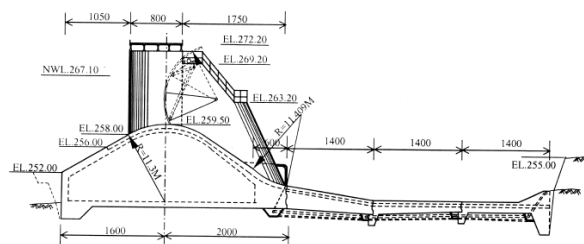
Transverse cross section of spillway of Shin-Kang Dam.
